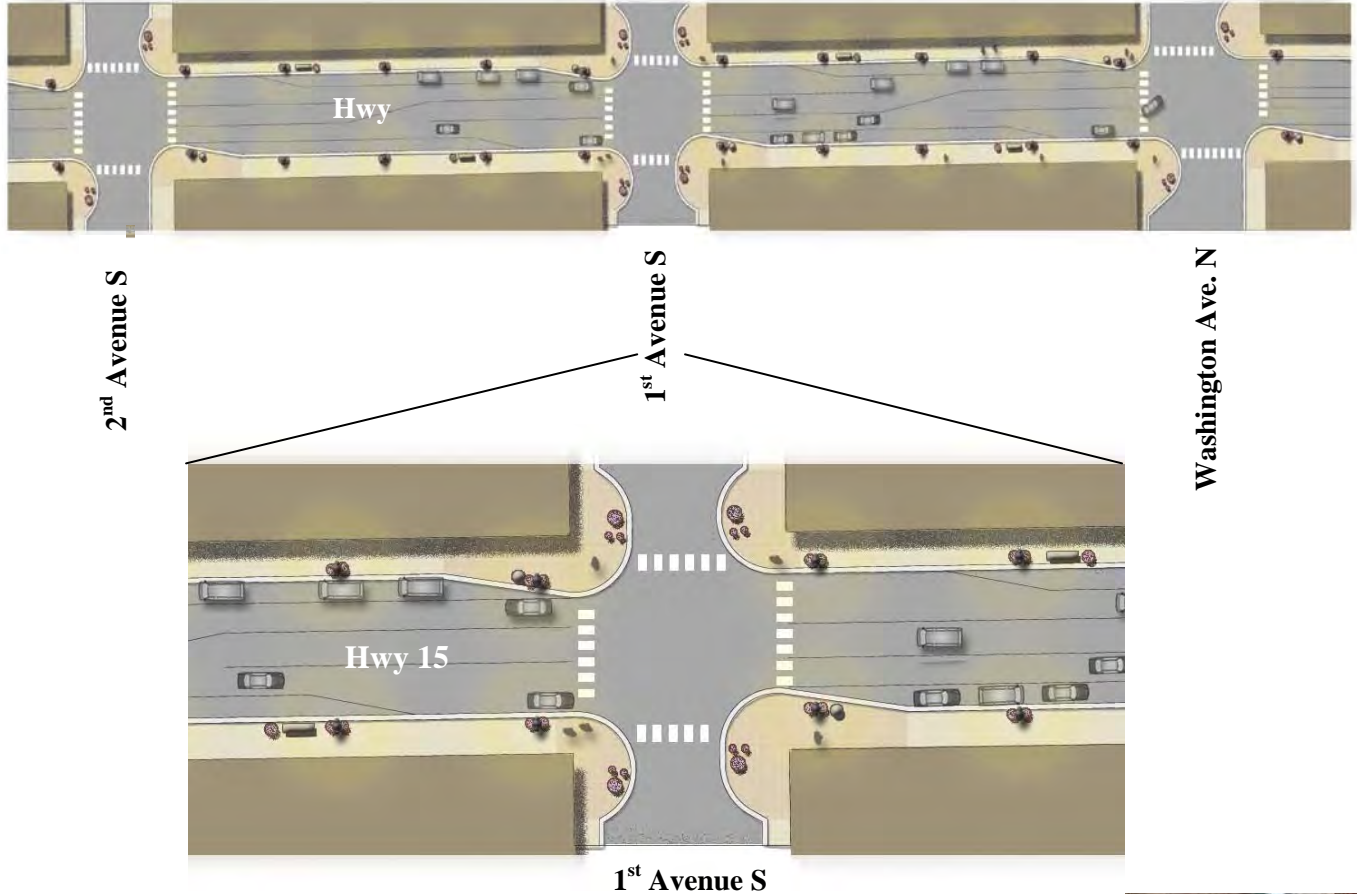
Proposed Highway 15 Typical Section – Downtown Hutchinson
